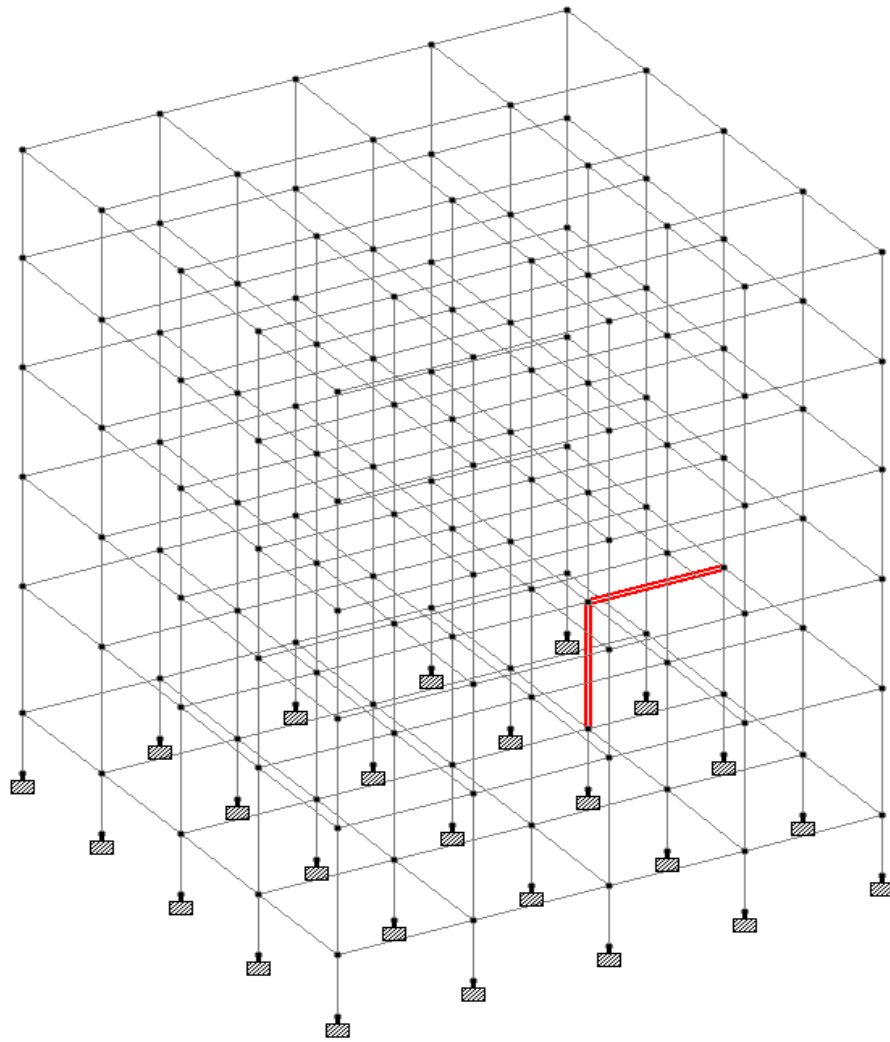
3-d view of the G+4 building model, highlighted members indicate the ones which have been considered for detailing
